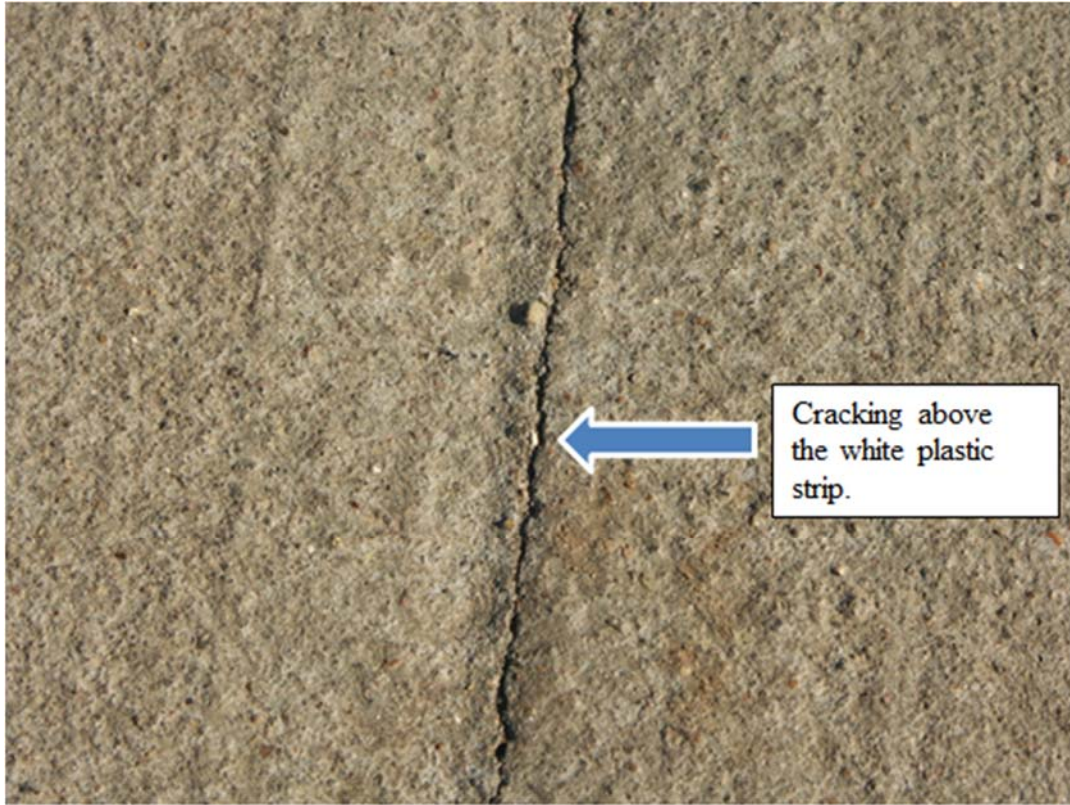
Cracking above plastic strip on bridge deck.
